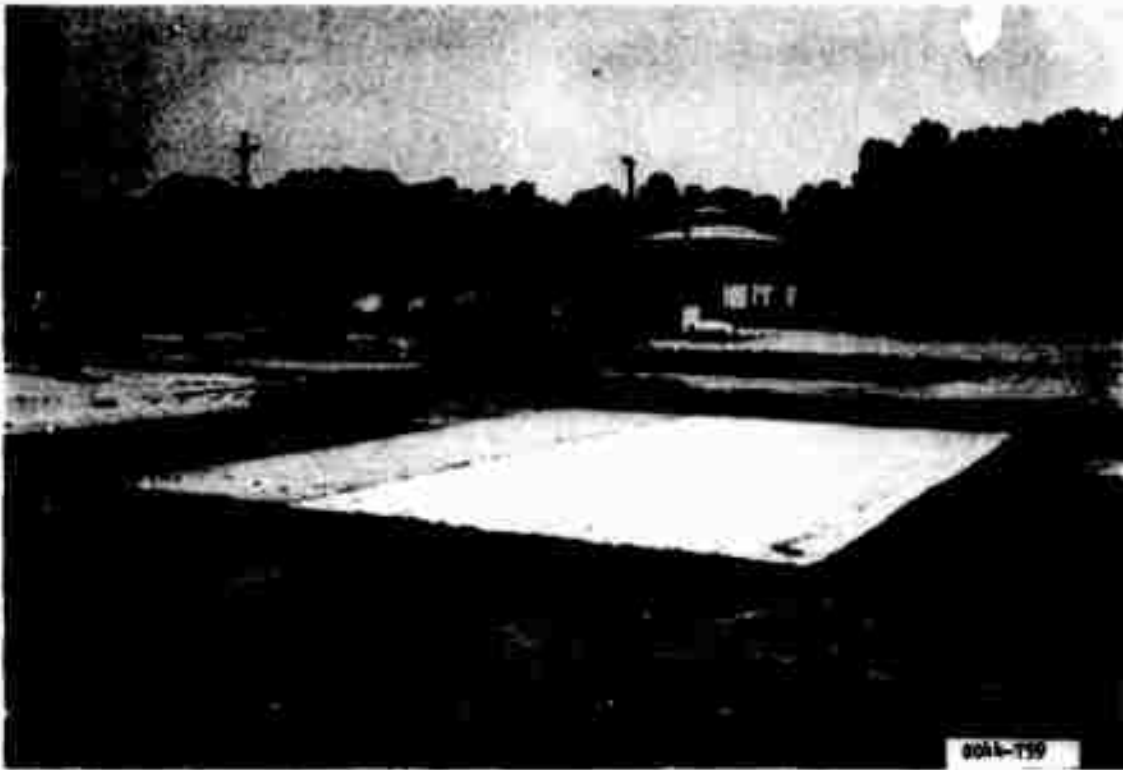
Completed installation of insulating materials on subgrade of subitems 5a-d of the rigid pavement test section
